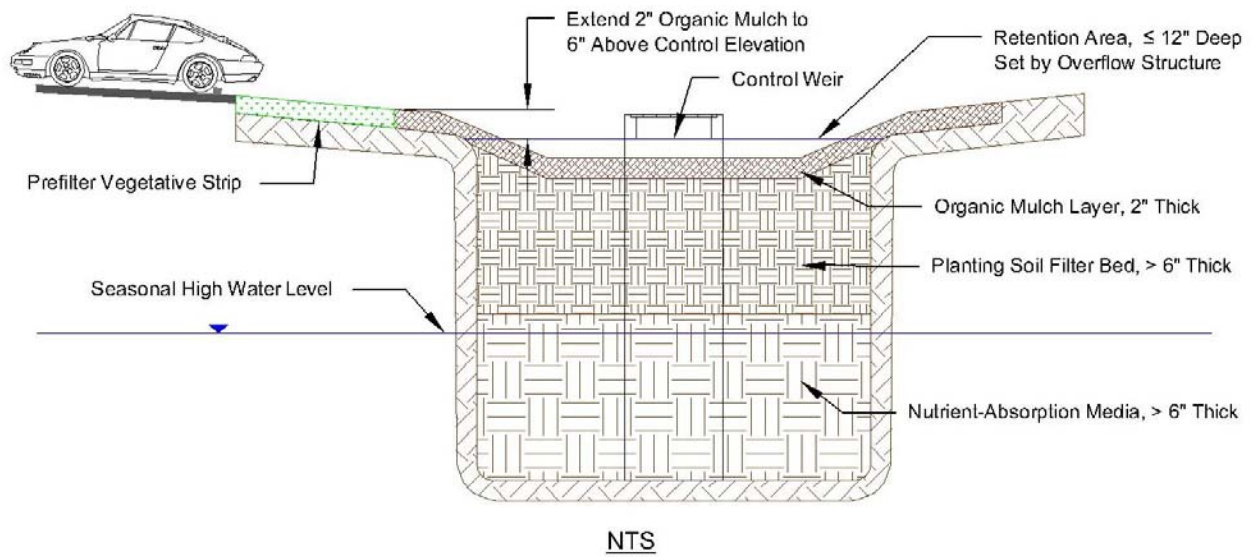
Cross Section View of a Shallow Bioretention System
